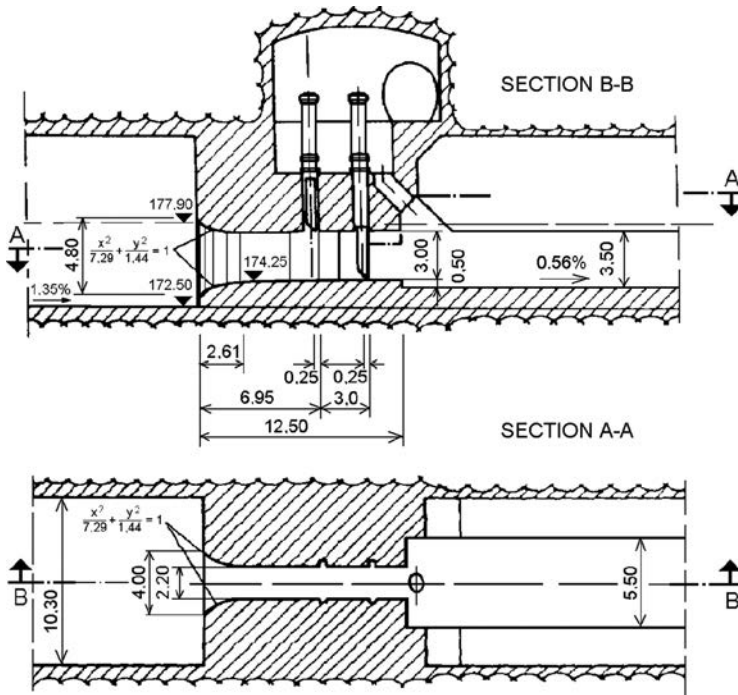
Gate-house with plain gates at the bottom outlet structure, Agios Nikolaos dam, Greece.
